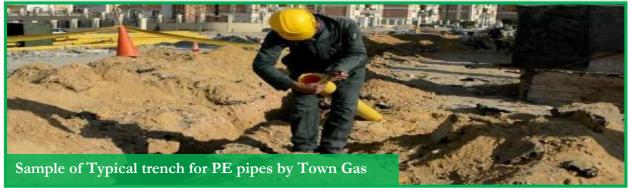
Picture showing sample of a typical trench for PE pipes by Town Gas
